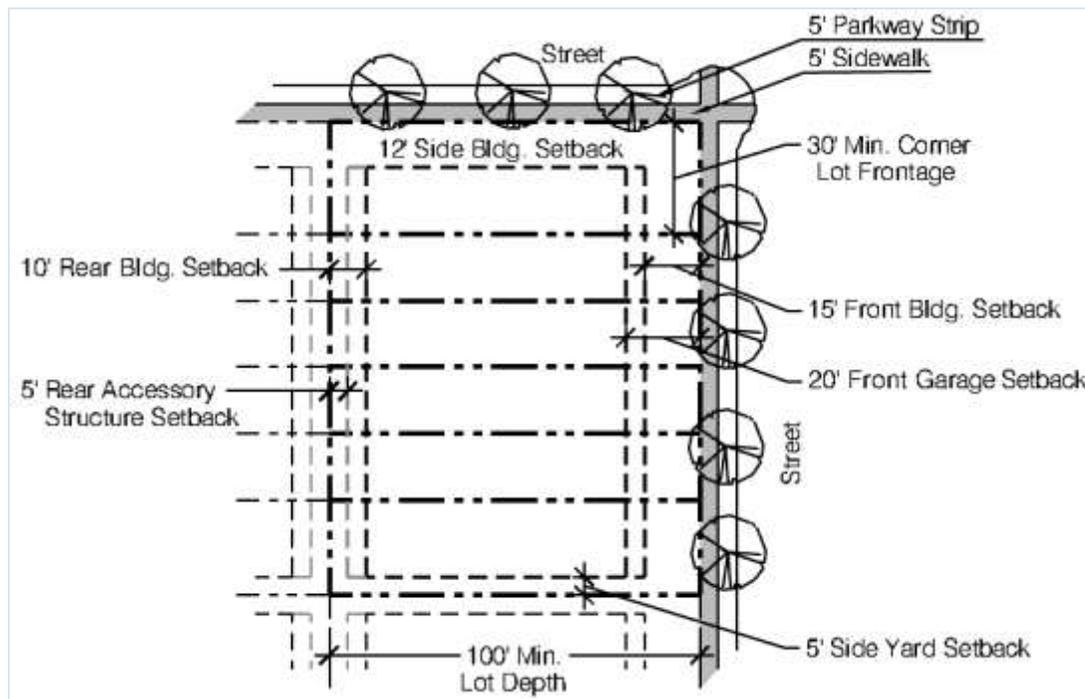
R-2 M SETBACKS - TOWNHOME CORNER LOT
